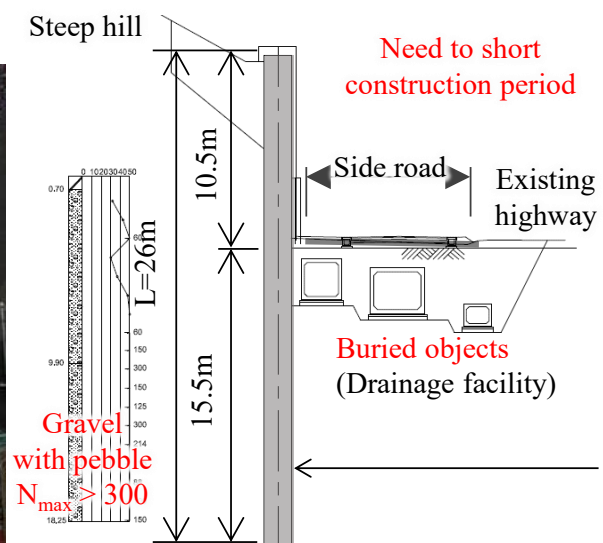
One of the constructed cantilever type steel tubular pile (CSTP) walls in Tokyo (Miyanohara et al., 2018)
